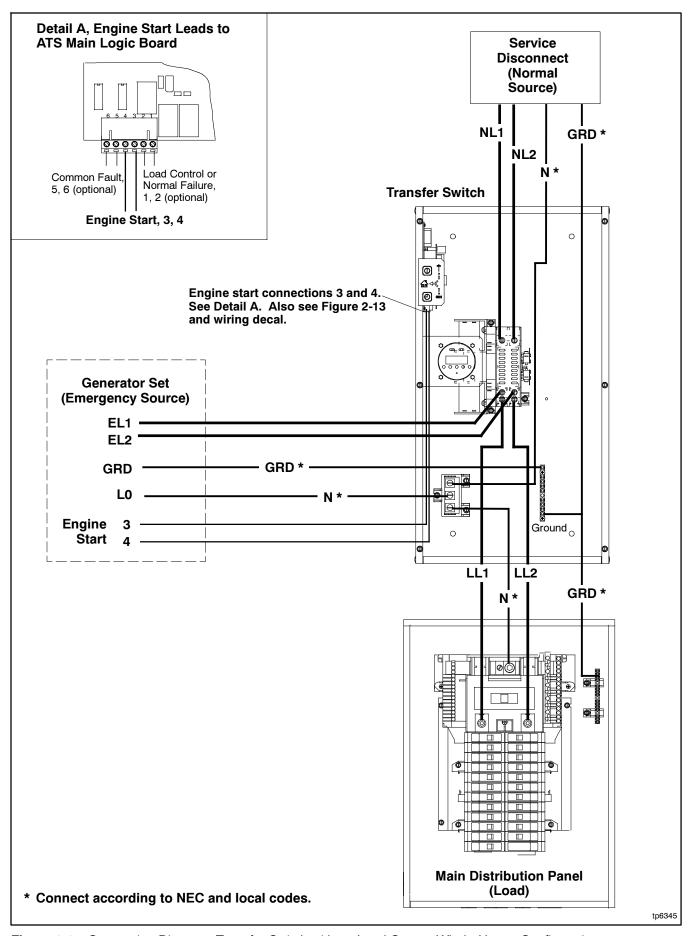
Connection Diagram, Transfer Switch without Load Center, Whole-House Configuration
